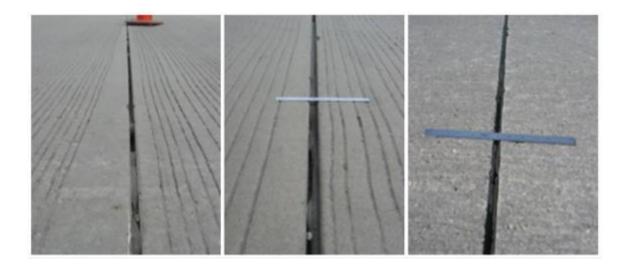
Photo. Examples of joint sealant failures (CP Tech Center)
